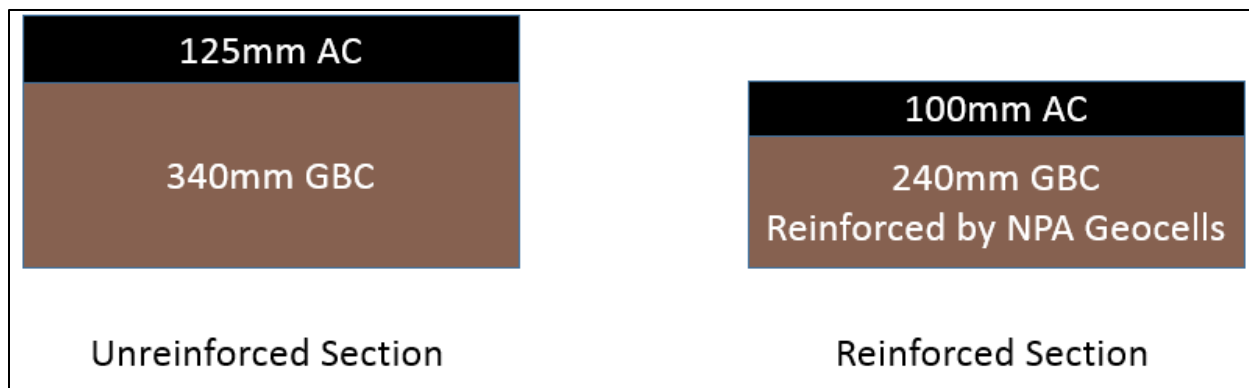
Typical unreinforced pavement section vs. typical NPA Geocell reinforced section
